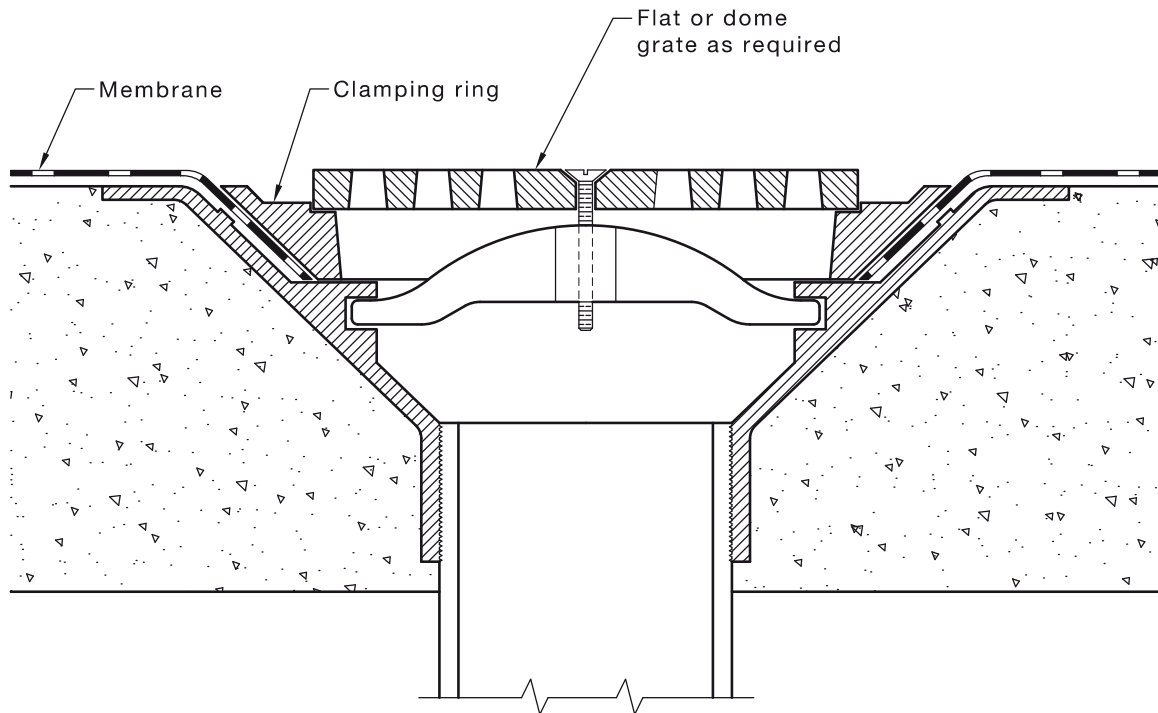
DRAINAGE DETAIL FOR AN EXPOSED MEMBRANE
